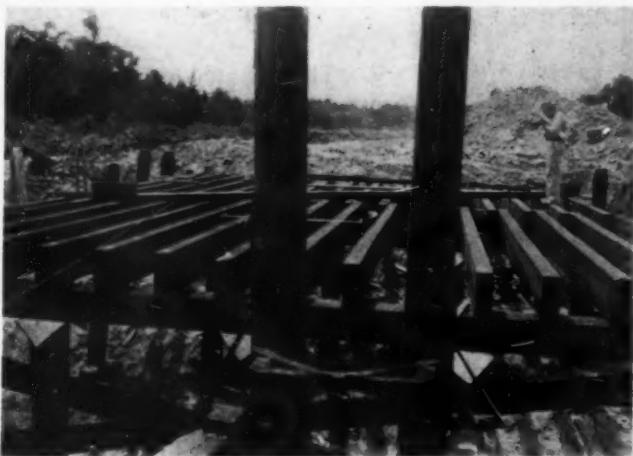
Trestle Span Under Construction Looking Through Pile Driven Leads
